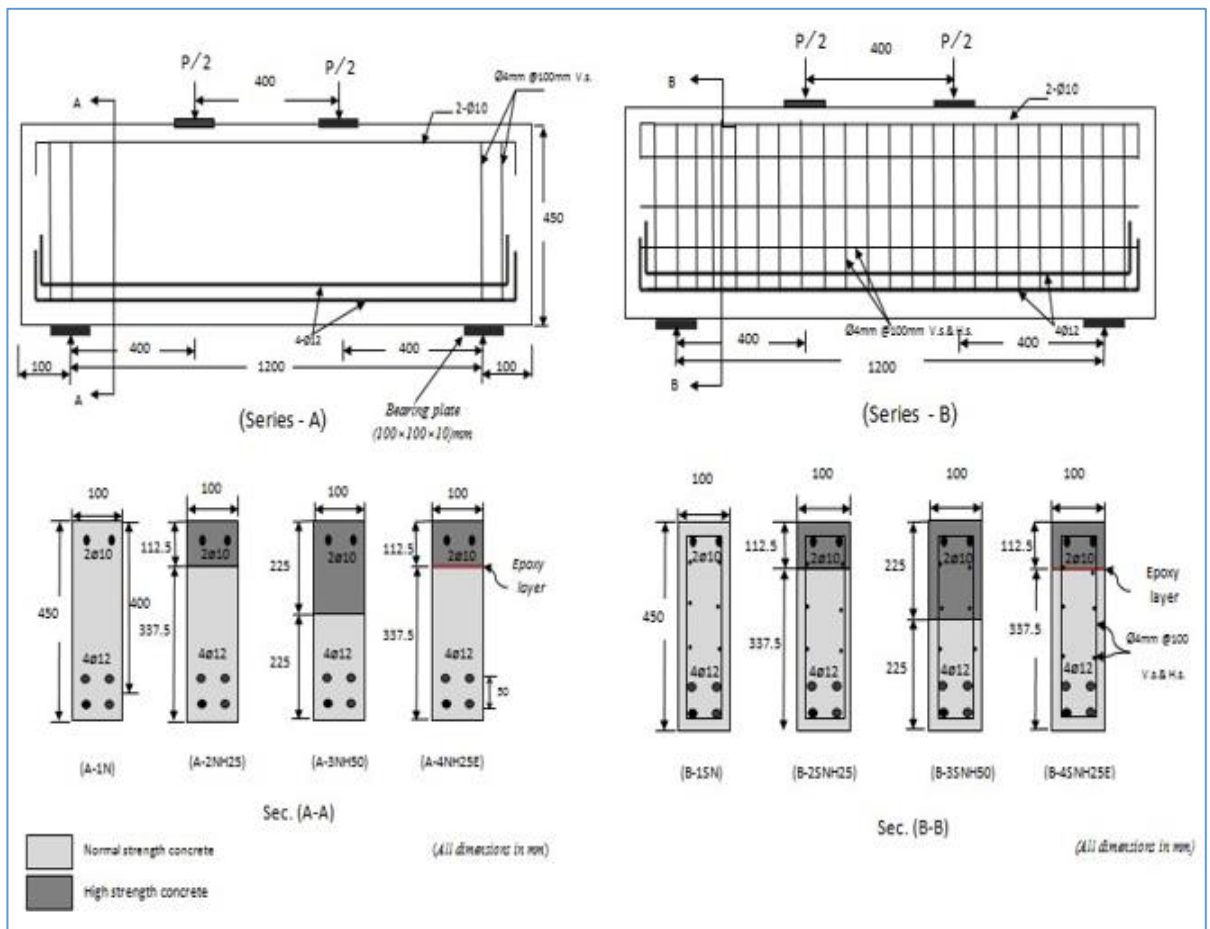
Loading and specimen's details (Ammar & Maha).
